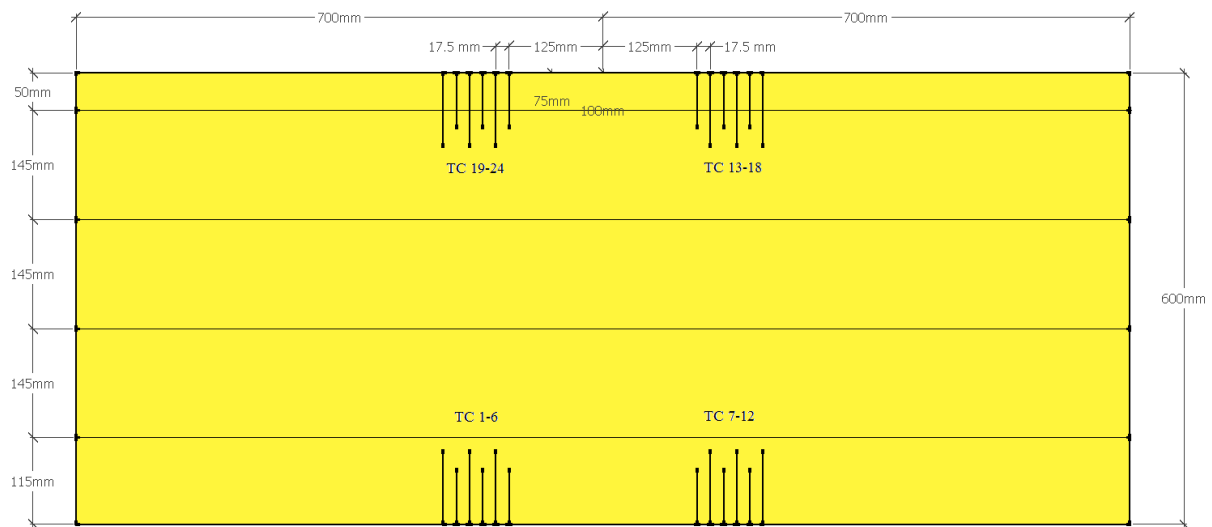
Top view of ready CLT sample with the positioning of thermocouples and dimensions.
